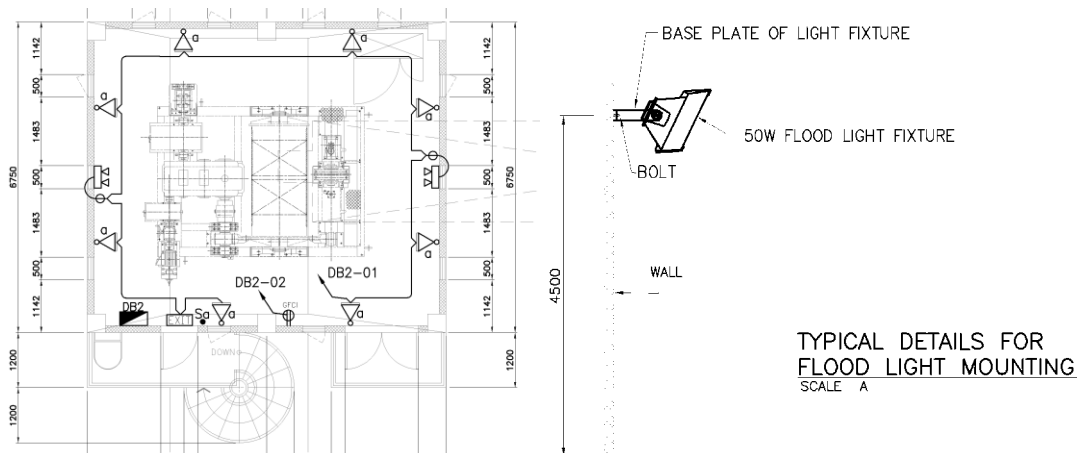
Example of Lighting Fixtures for Local Control House
